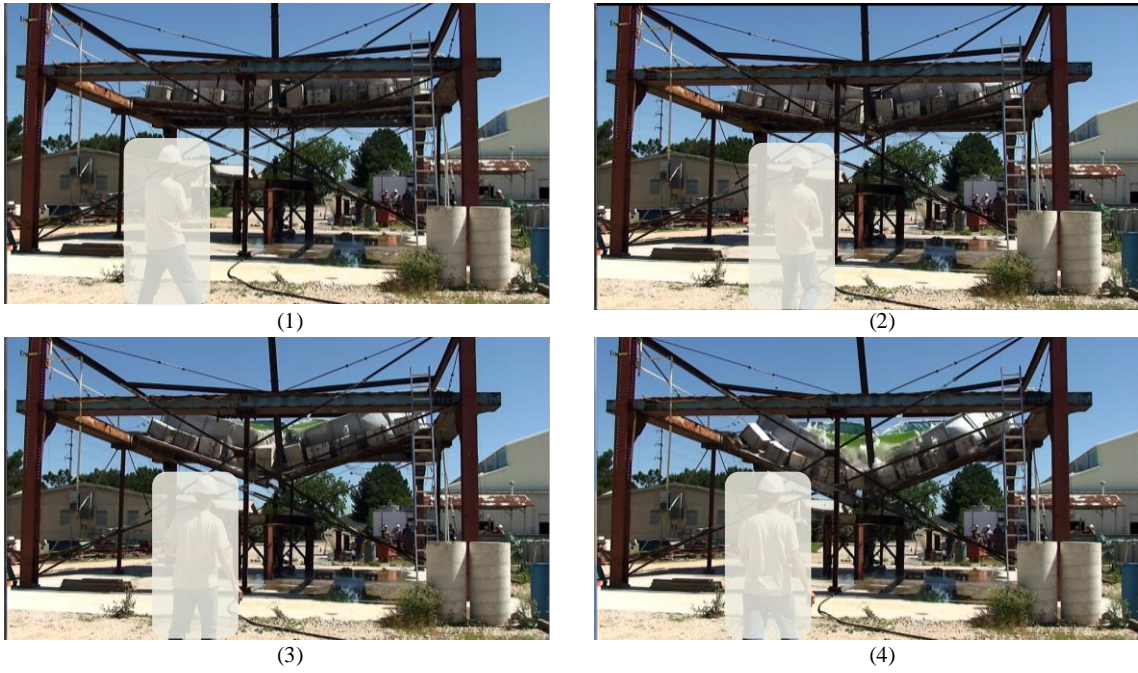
ECL specimen: snapshots from video footage during collapse, north view
